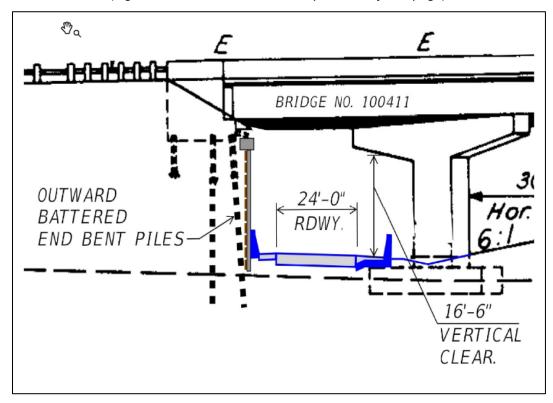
2-Lane On-Ramp Under Bridge-No. 100411 – Section View
